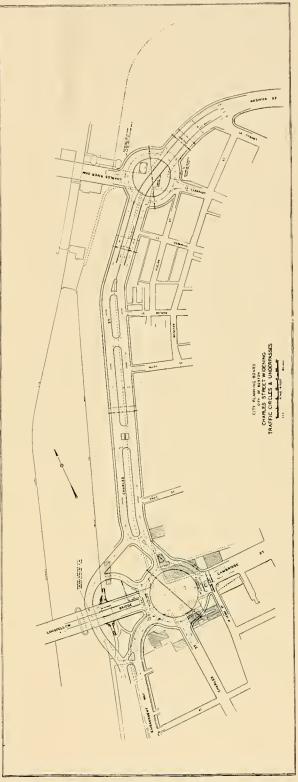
CHARLES STREET WIDENING, TRAFFIC CIRCLES AND UNDERPASSES.
